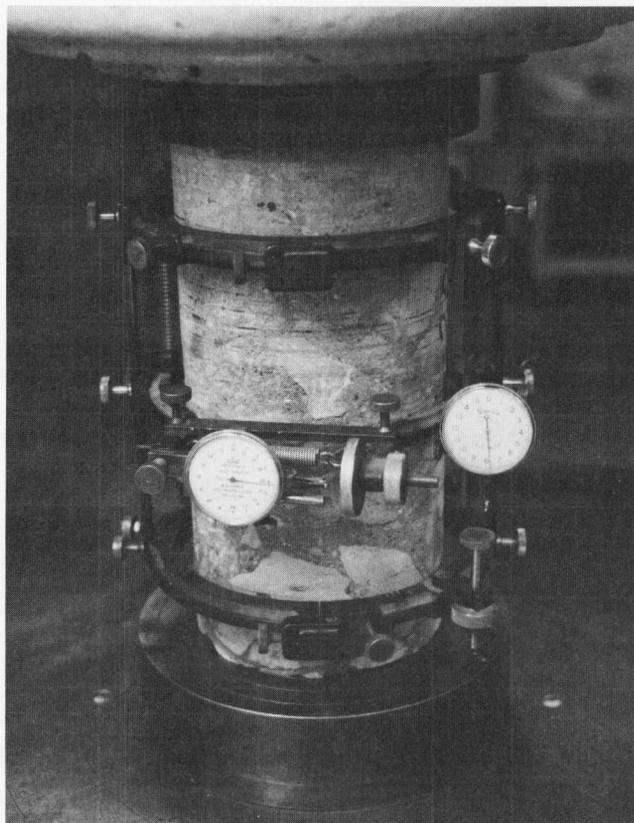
A 6- by 12-inch (152- by 305-mm) concrete cylinder with a compressometer-extensometer mounted and ready for use.
